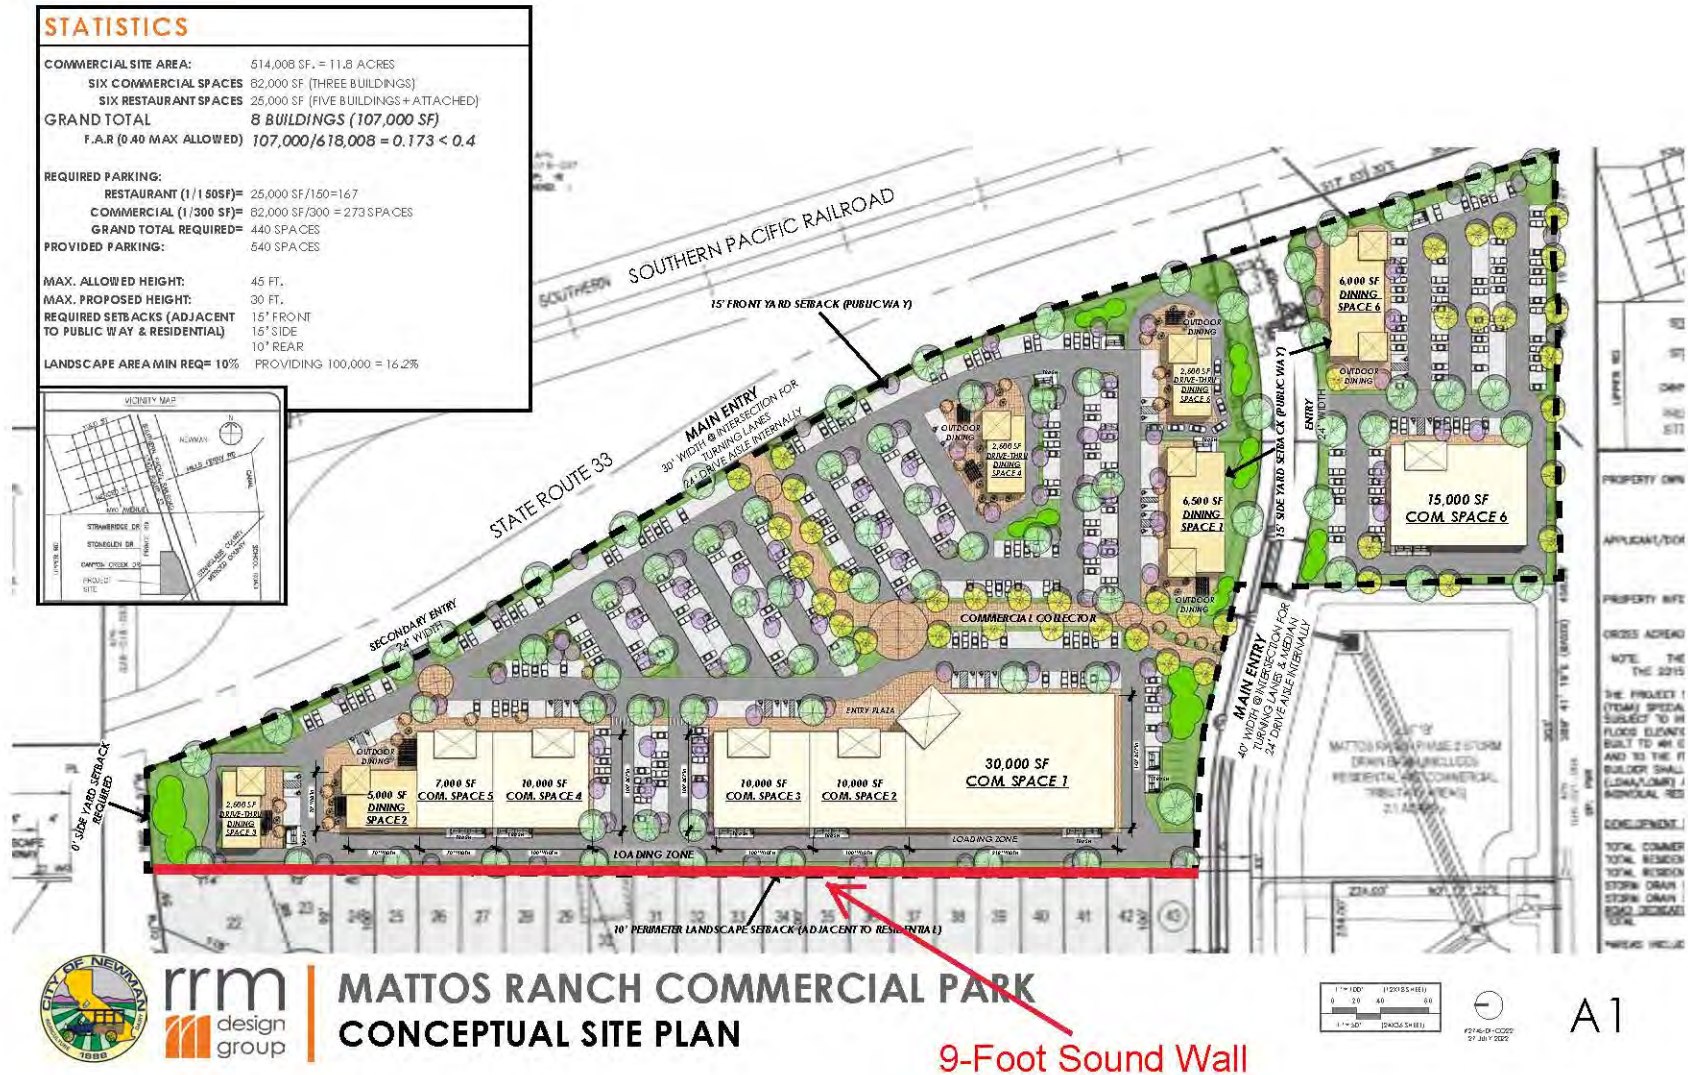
COMMERCIAL PARK CONCEPTUAL SITE PLAN
